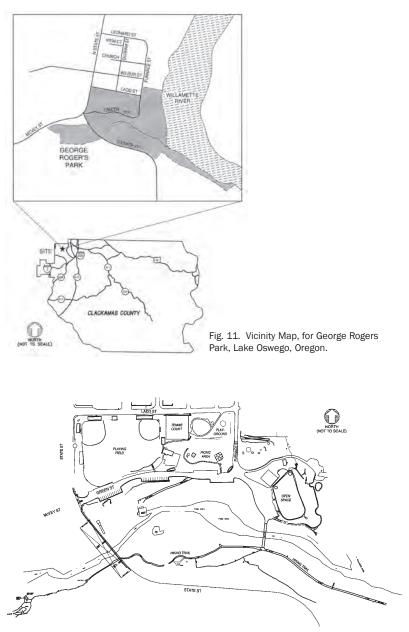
Site Plan for George Rogers Park, Lake Oswego, Oregon.
